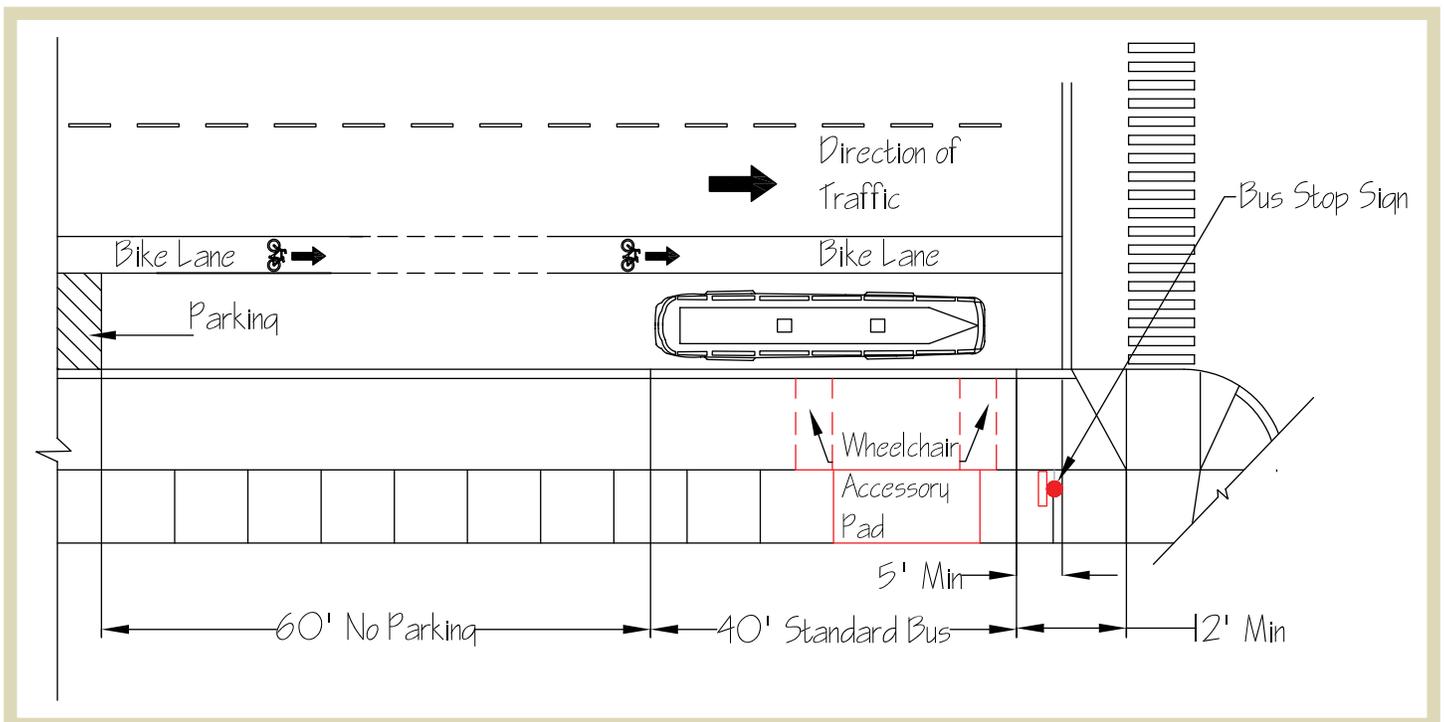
| A typical bike lane-curb side bus stop configuration.
